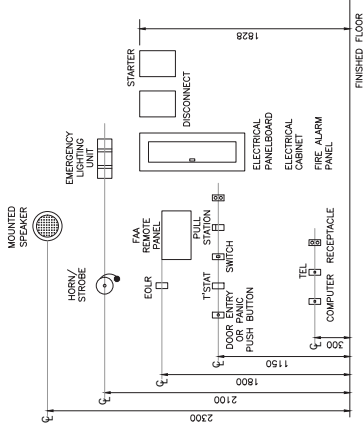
GUARDHOUSE TELECOMMUNICATIONS
